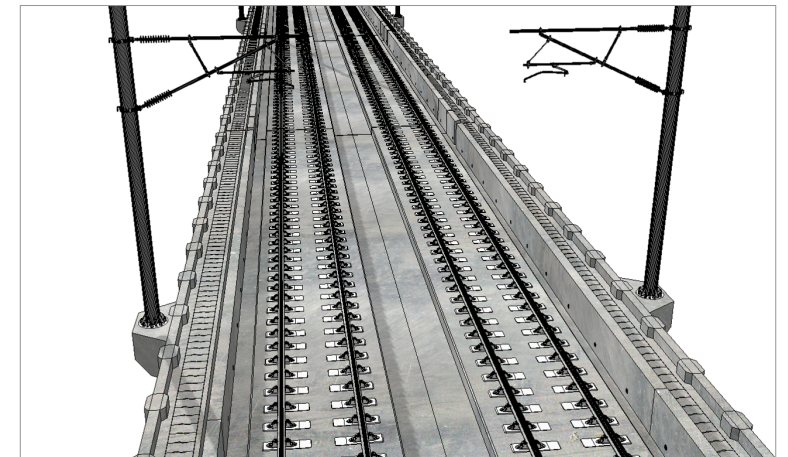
Detailed design review. [Courtesy of Seoyoung Engineering Co., Ltd.]
